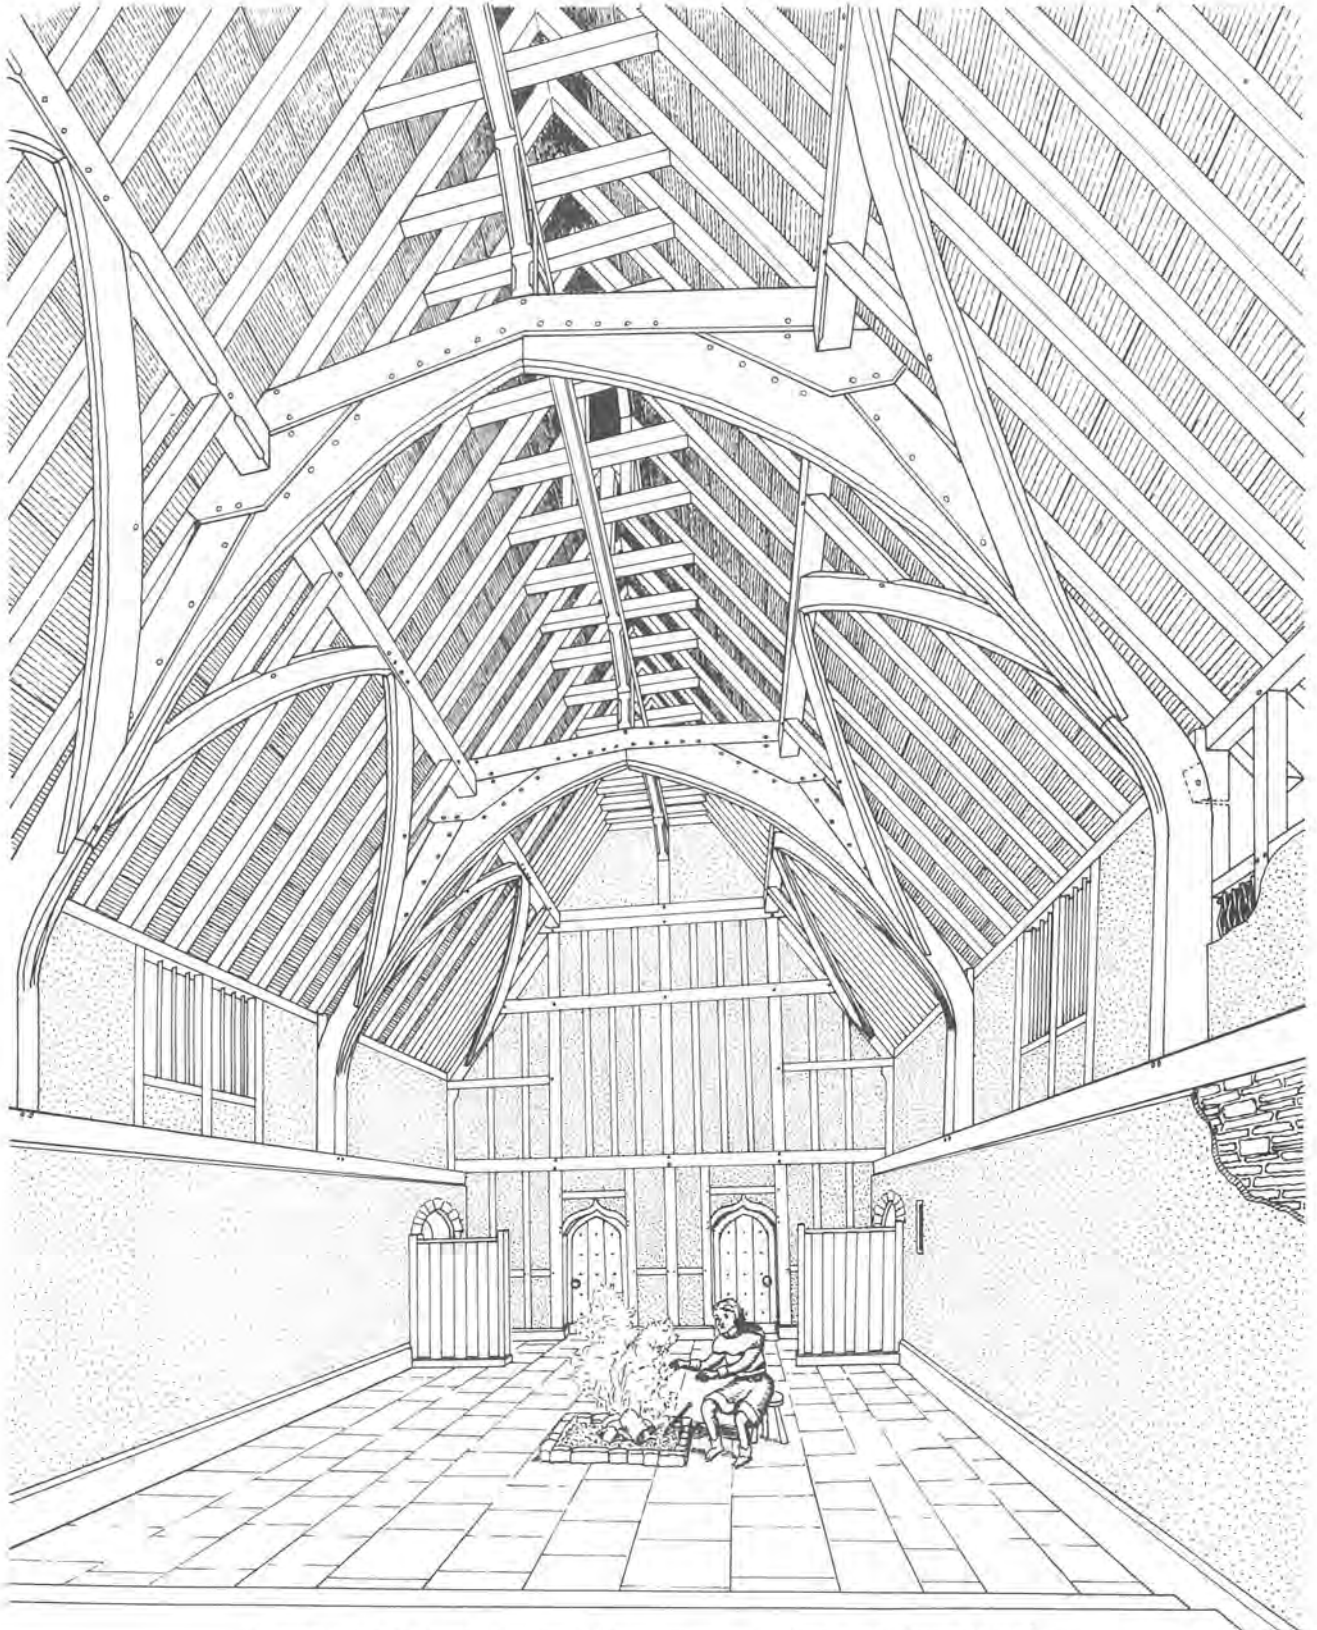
Hall House, Newland. Reconstruction looking west, drawn to scale.
